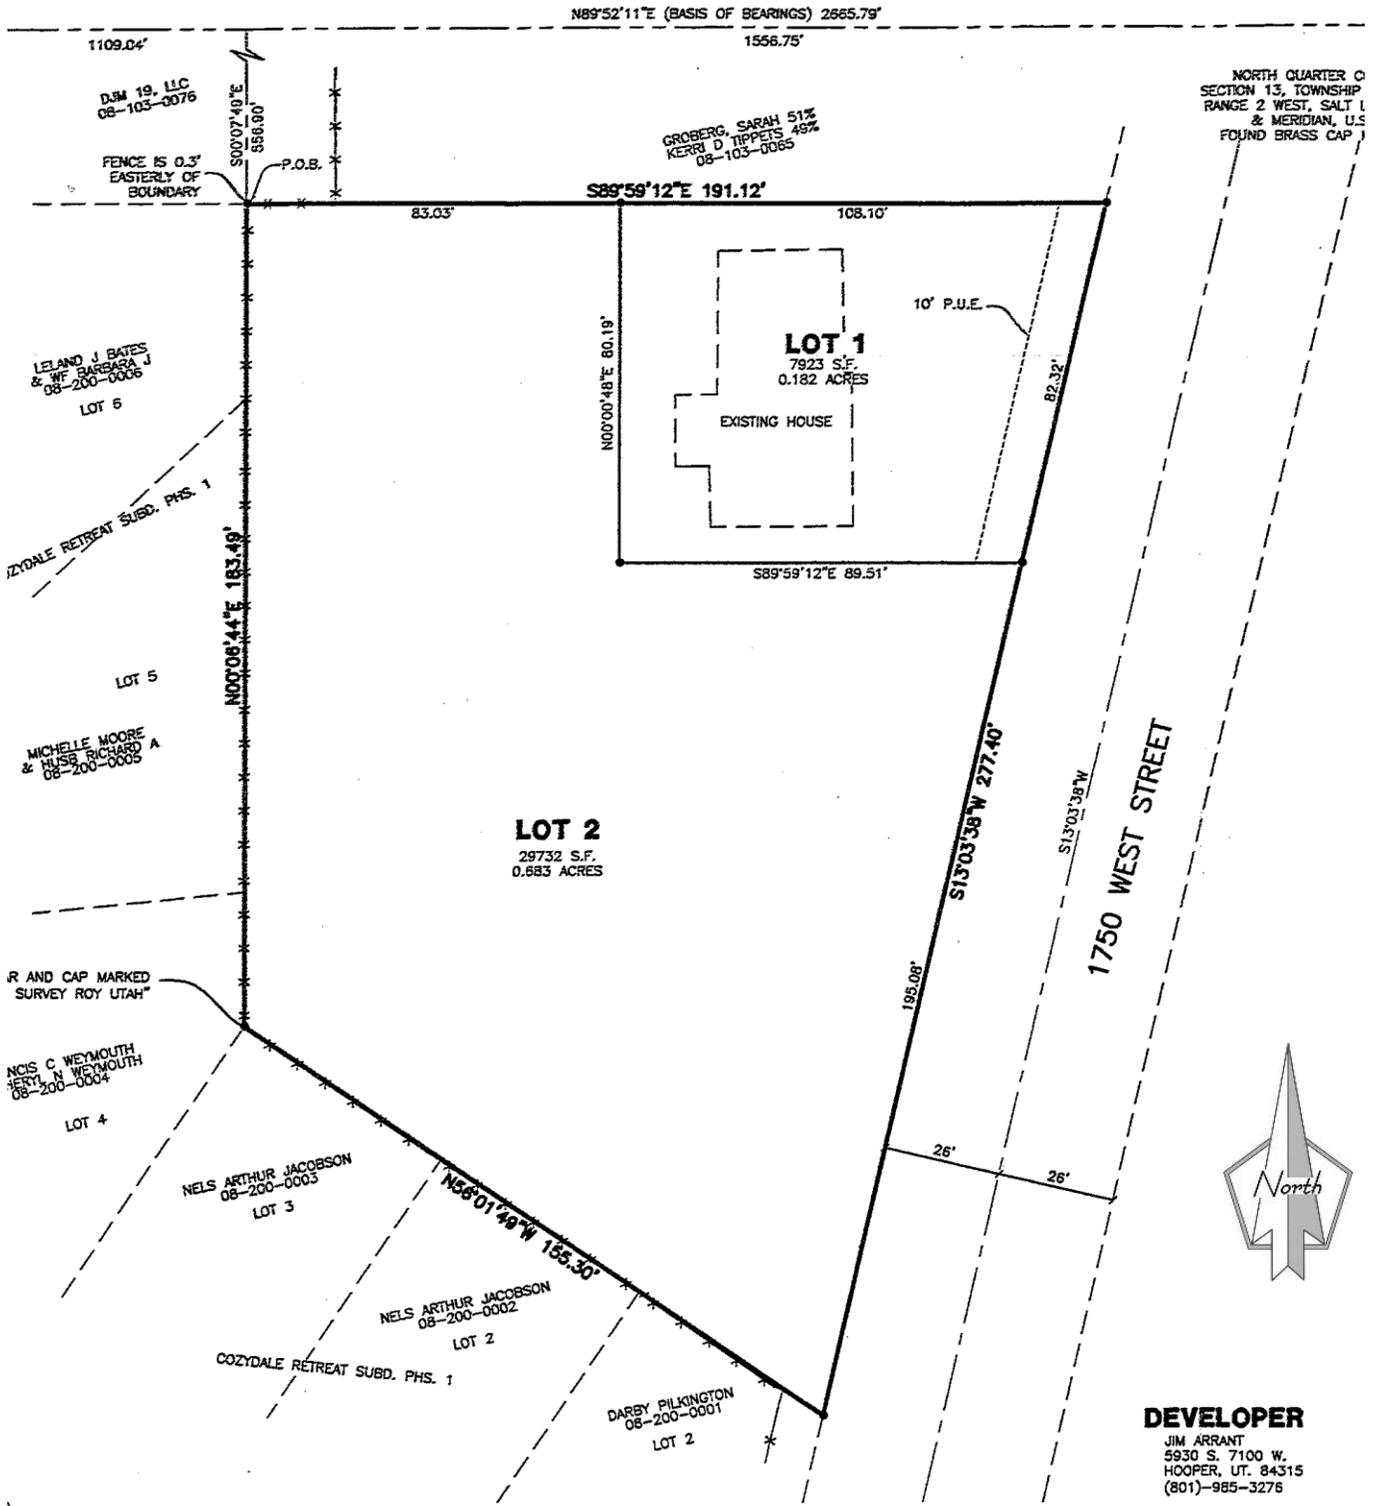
EXHIBIT "B" - PRELIMINARY SUBDIVISION PLAT
